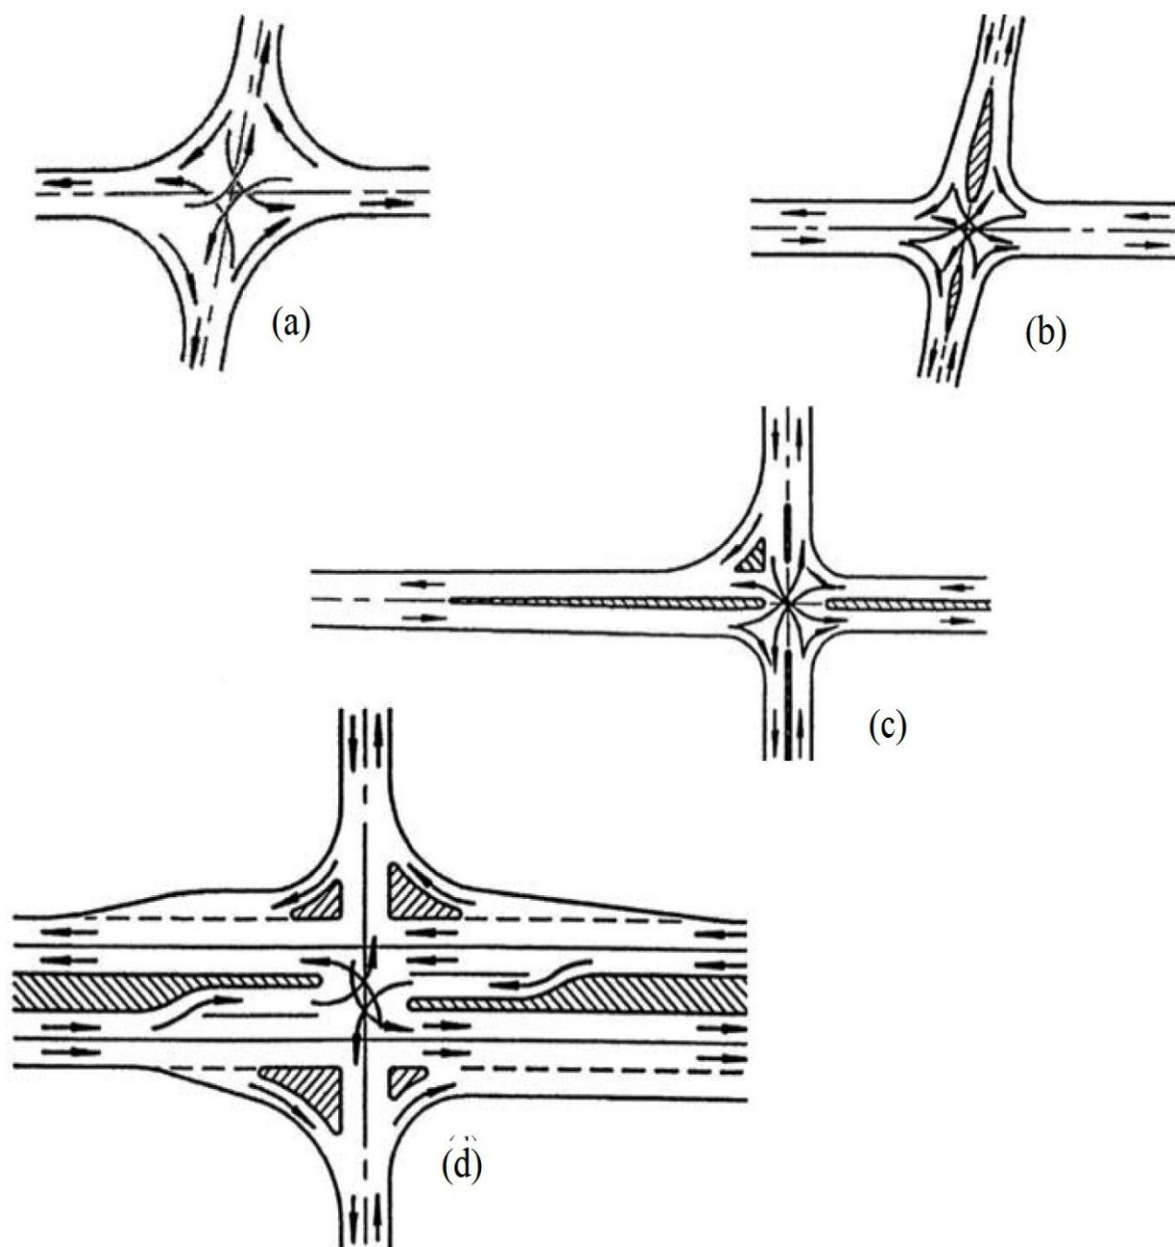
/2: Examples of Four-Leg Intersection, [2, p. 272]
